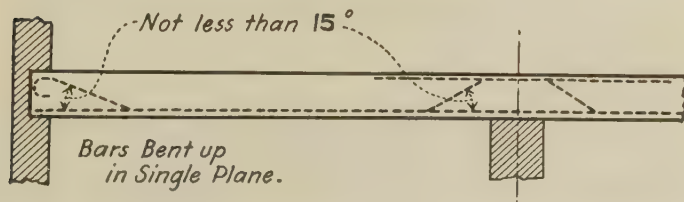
Typical Reinforced Concrete Beam; Principal Longitudinal Bars Bent up in Single Plane.
